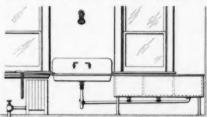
Elevation of outside kitchen wall, showing recommended position for trays, sink, etc.
